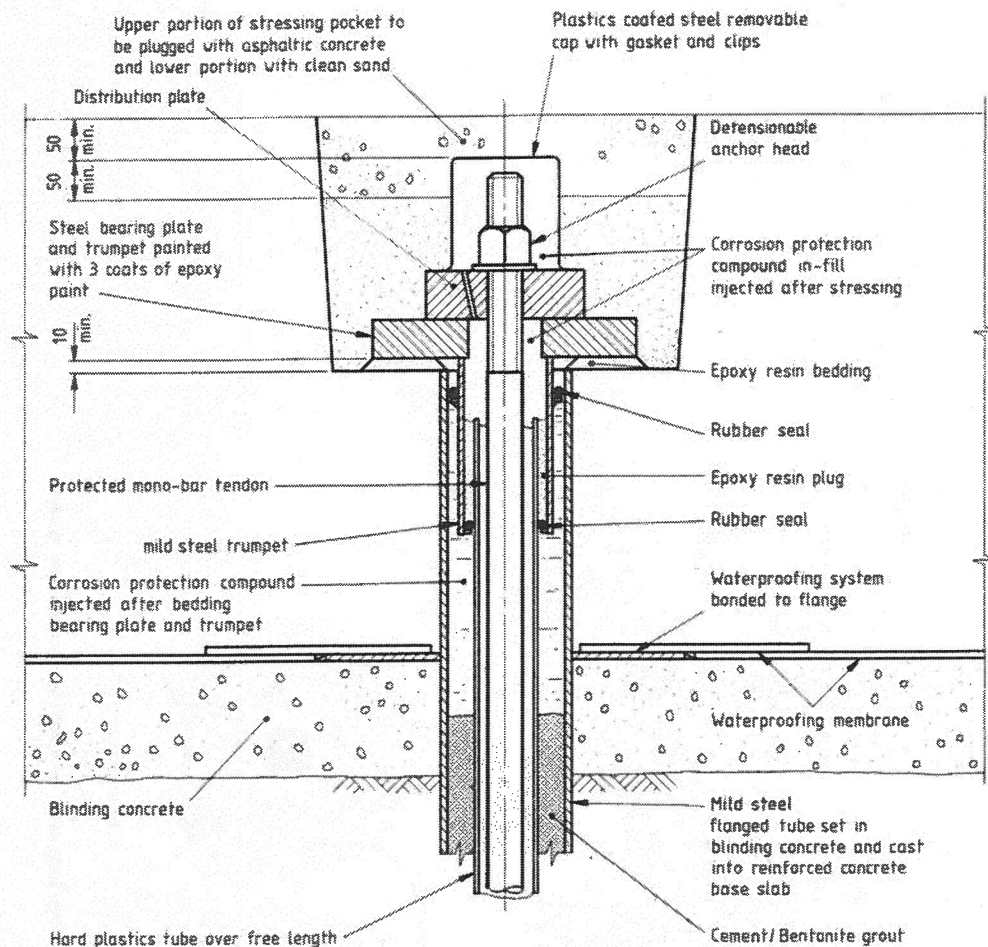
Typical detensionable anchor head detail for double protection of bar tendon in a water retaining structure
